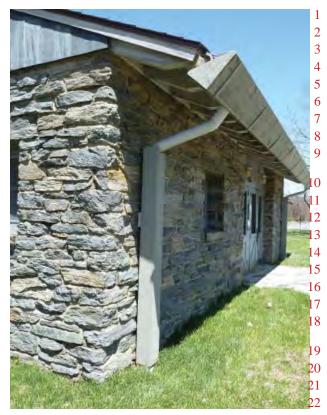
Typical round metal downspouts with wood wrapping on south elevation. 23
